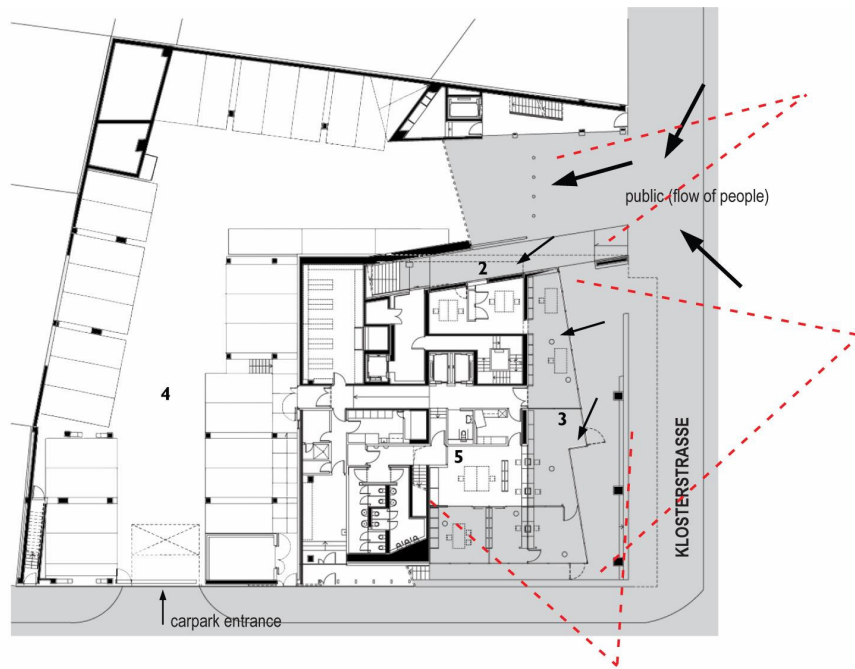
Ground Floor Plan, scale: approx. 1/500 (Brensing, 2004, 48-9).
